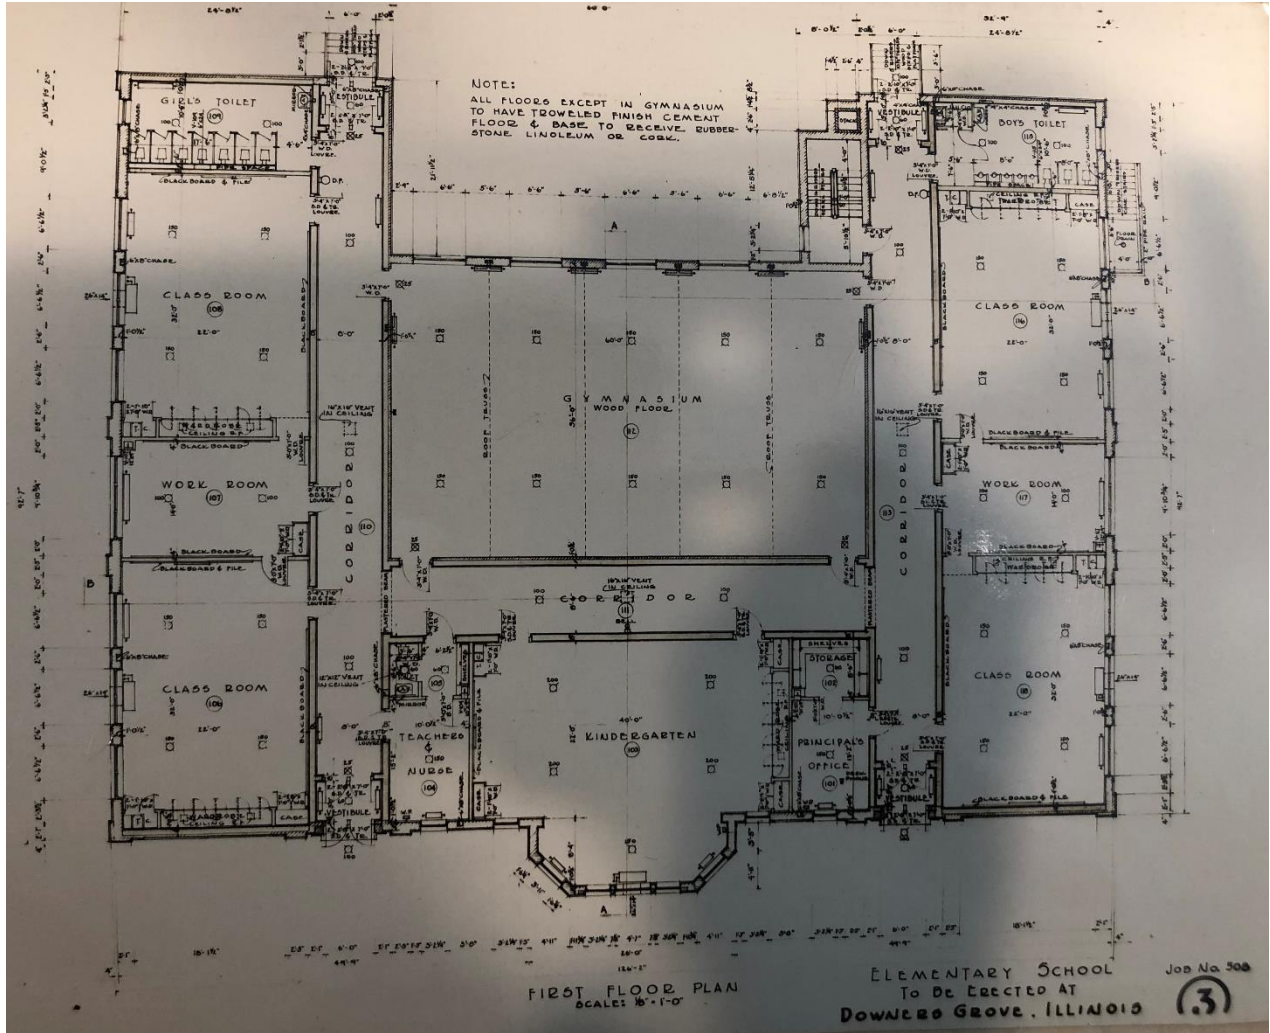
J.C. Llewellyn & Company, First Floor Plan for Longfellow School, 1928.
